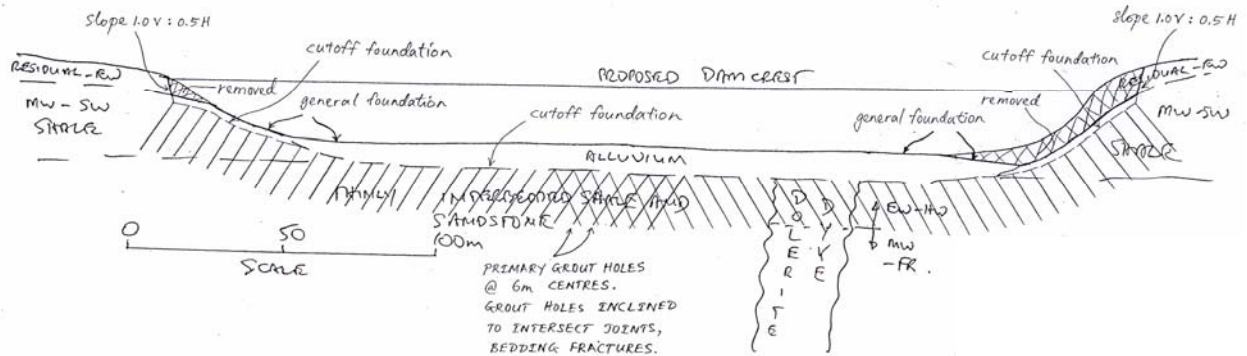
Simplified longitudinal section of the dam with the foundation treatments
